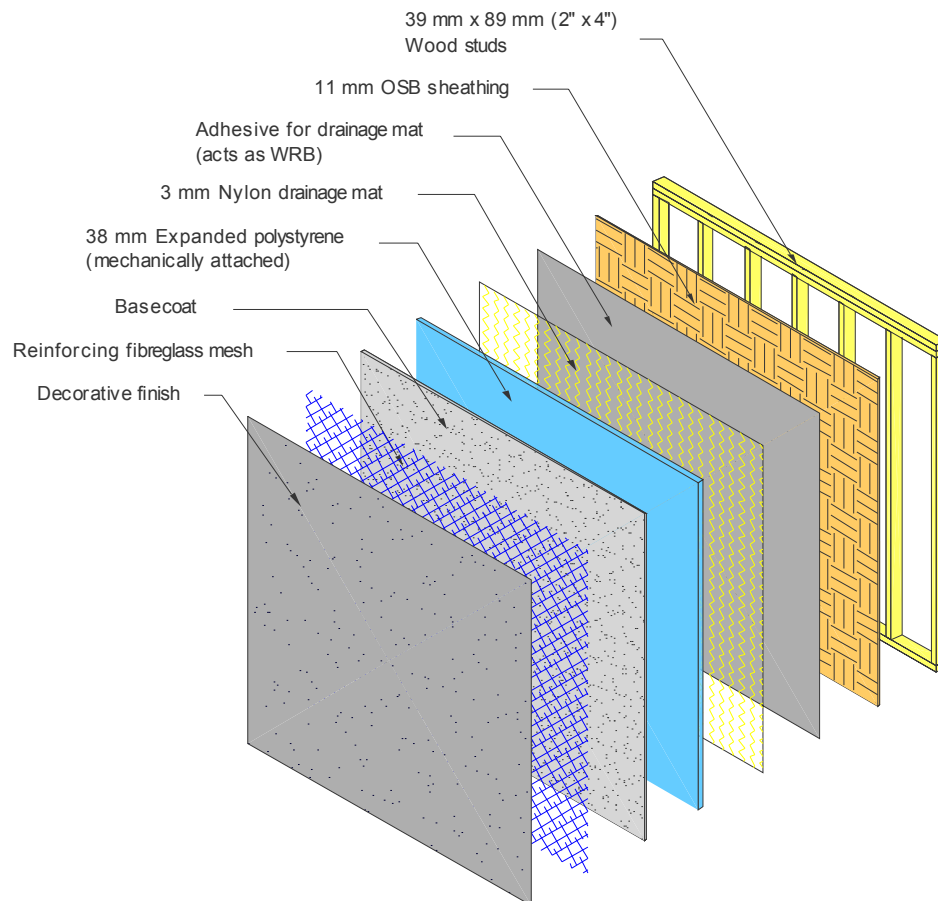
EIFS-clad wall (specimen No. 10) with a WRB and drainage mat
